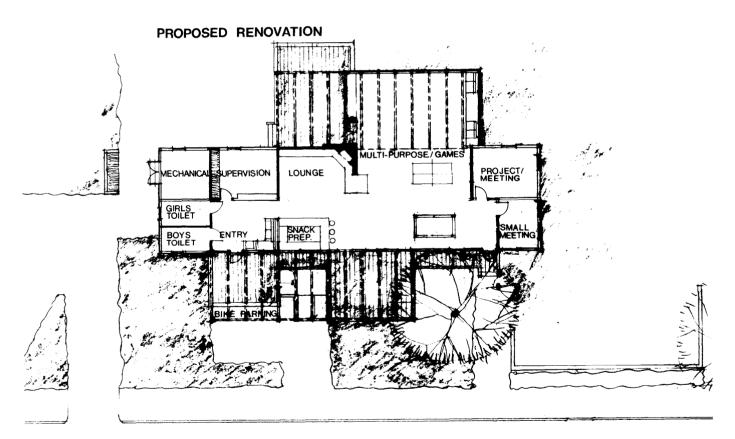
Renovated Small Neighborhood DYAC: Floor Plan
